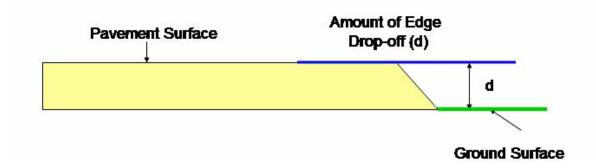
Measurement of Pavement Edge Drop-Off Tangent to Pavement Surface
